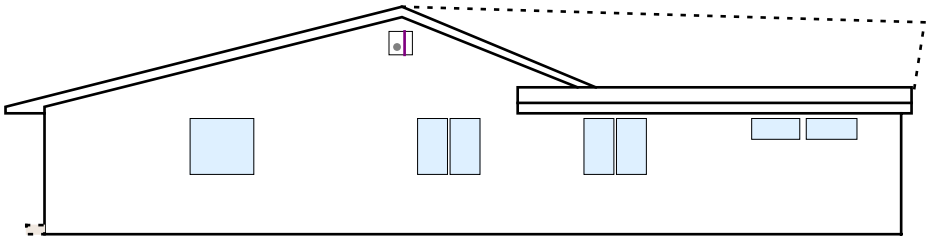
Elevation view existing house viewed from inside from east looking west. Southern most window (to the left in the diagram) is in the addition. New roof line (solid line) runs from the roof peak to the south. Old north roof line (dotted) is in the middle of the occupied (non-carport) north part of existing house.
